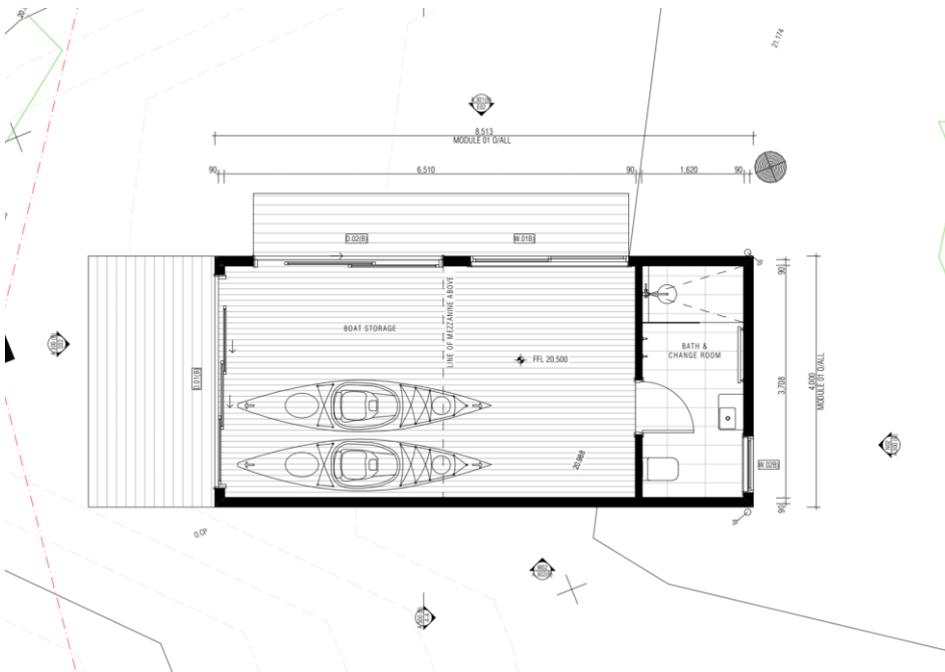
Proposed for plan of outbuilding to be used as a watercraft storage shed.
